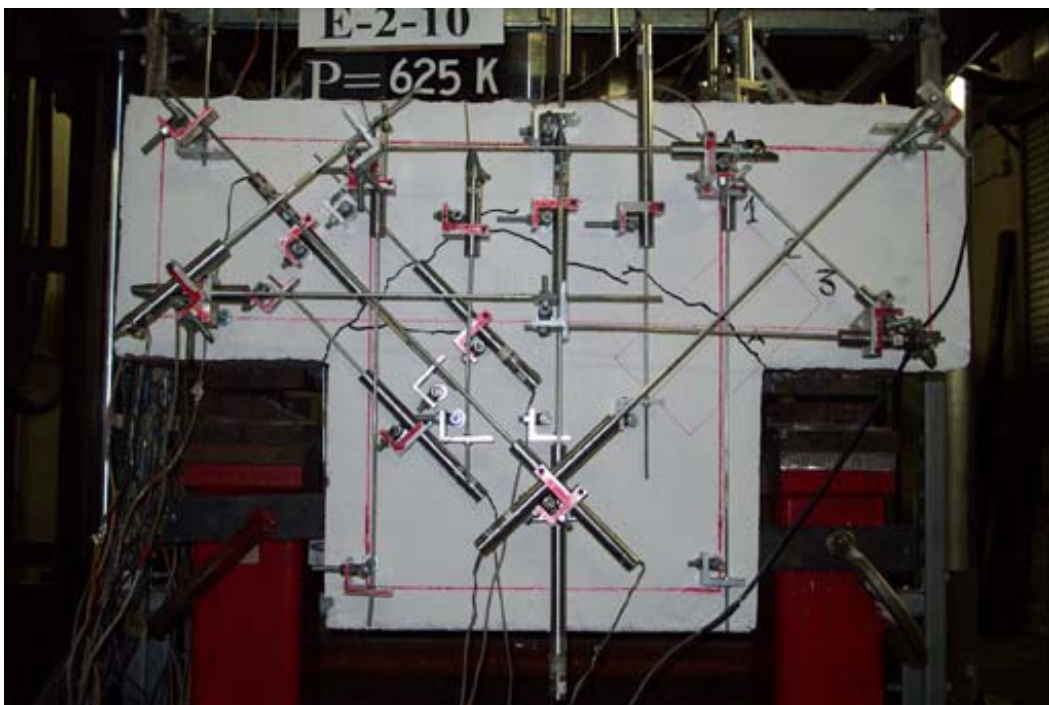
(d) Diagonal and horizontal cracks in Specimen E-2-10
